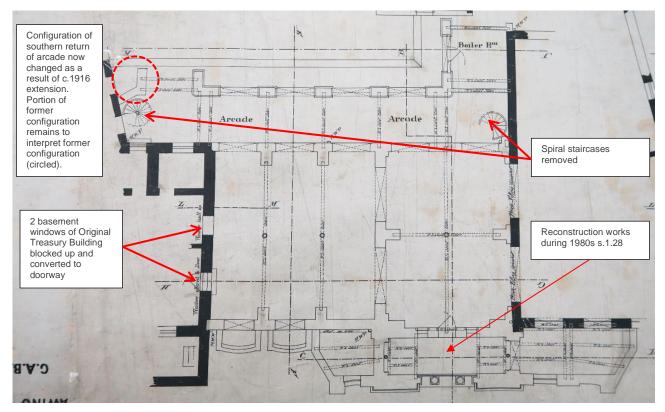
Basement Floor Plan, by Vernon, December 1897
